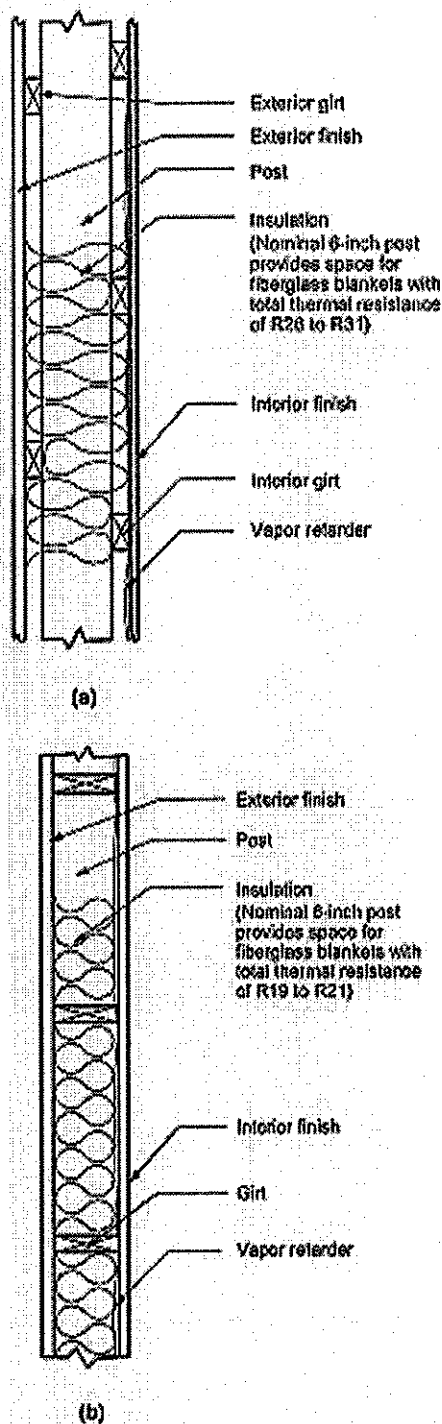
Typical post frame wall sections with (a) girts on exterior and interior of posts, and (b) girts between posts.
